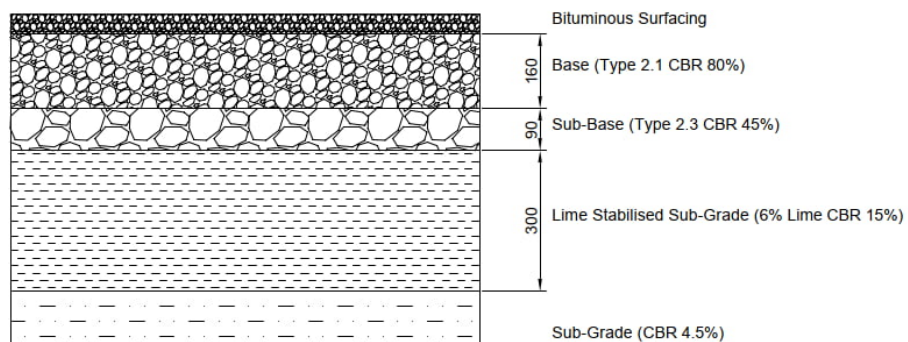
Design pavement configuration incorporating a lime-stabilised sub-grade.
